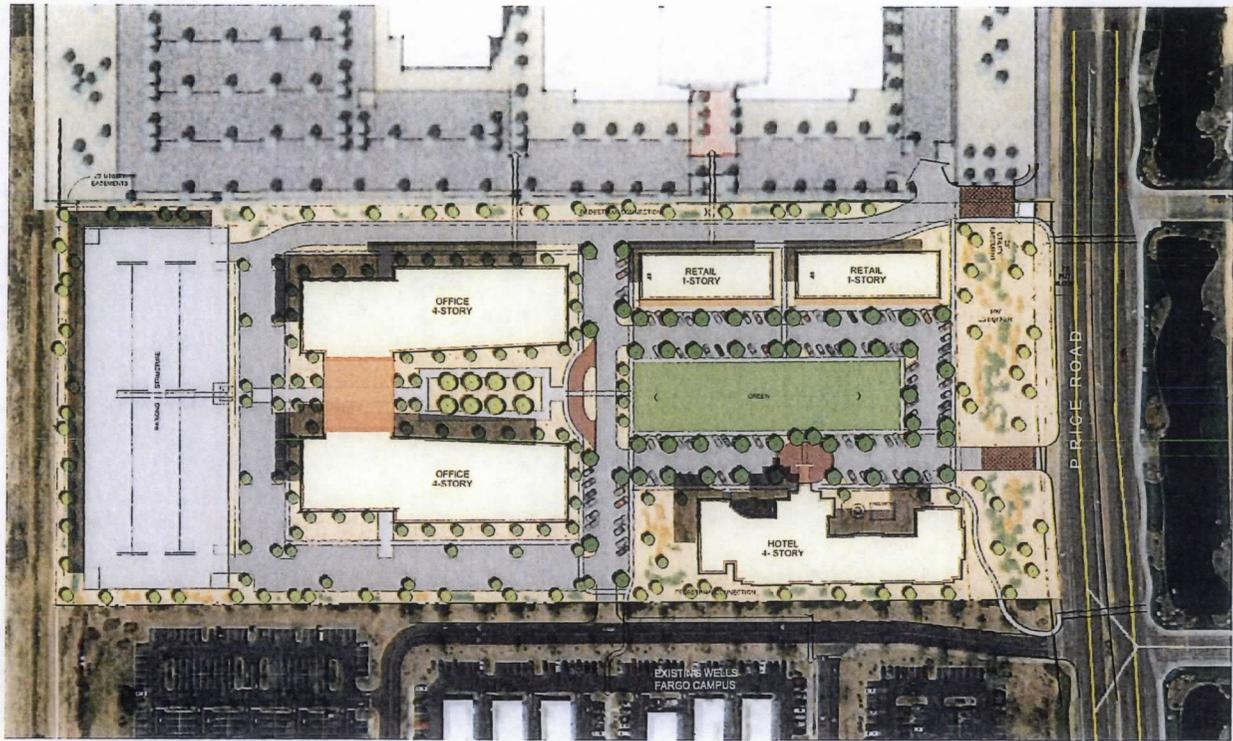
| CONCEPTUAL SITE PLAN C & D
